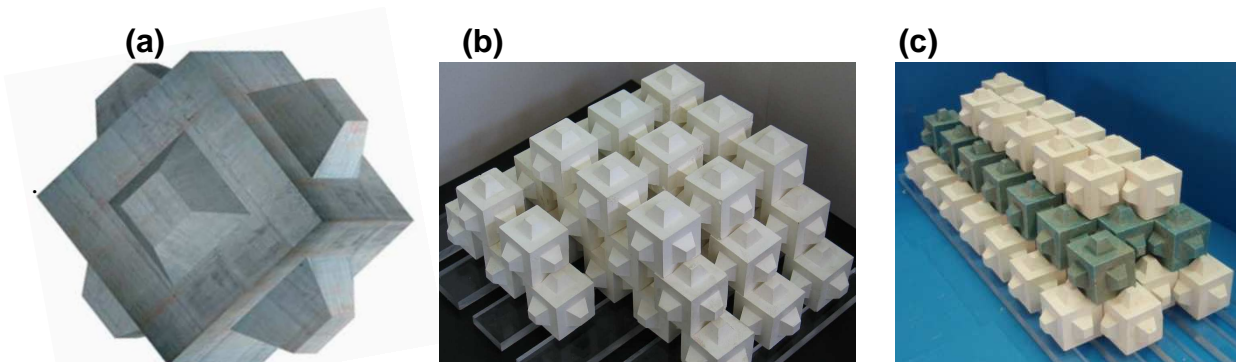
Cubipod: (a) 3D view, (b) open arrangement and (c) closed arrangement.
